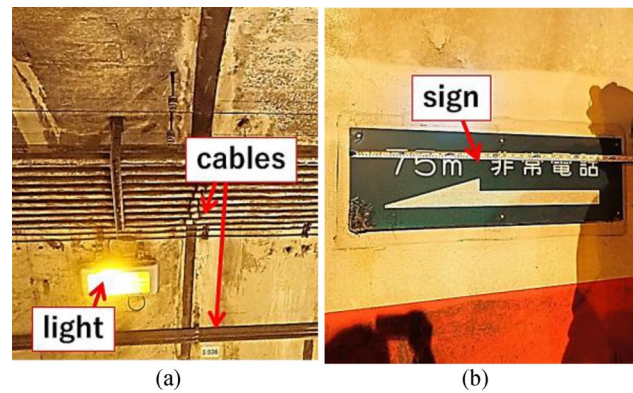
Appendages on real tunnel linings. a Cables and light. b Sign
